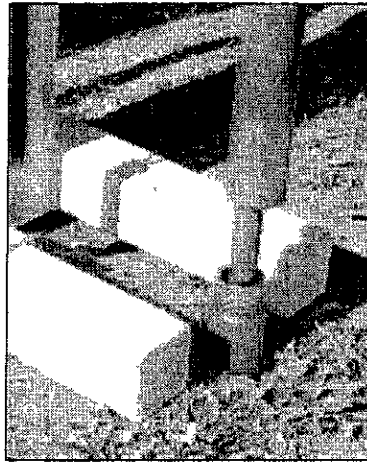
Place a 2.125-inch probe rod over the 1.0-inch probe rod and thread it onto the outer casing string.
